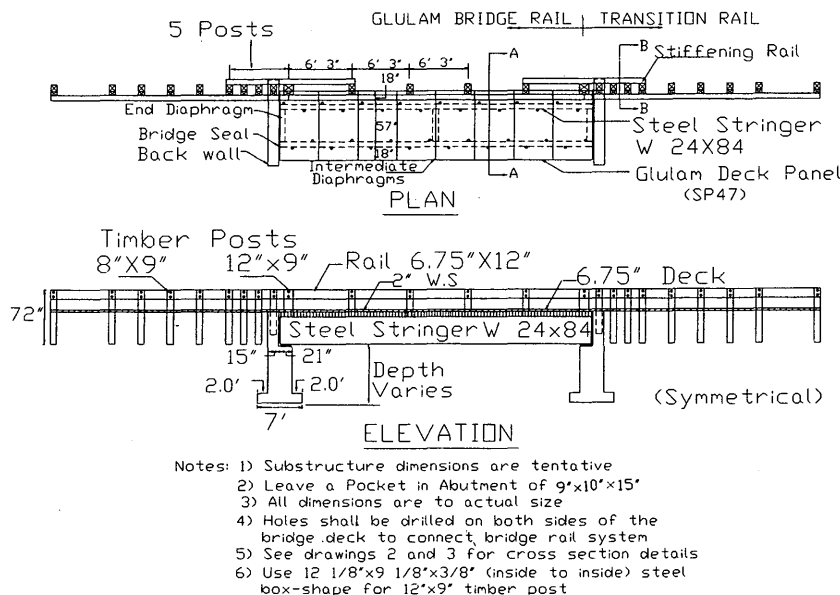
Timber Bridge Rail System 1 for PL-1: plan and elevation.
